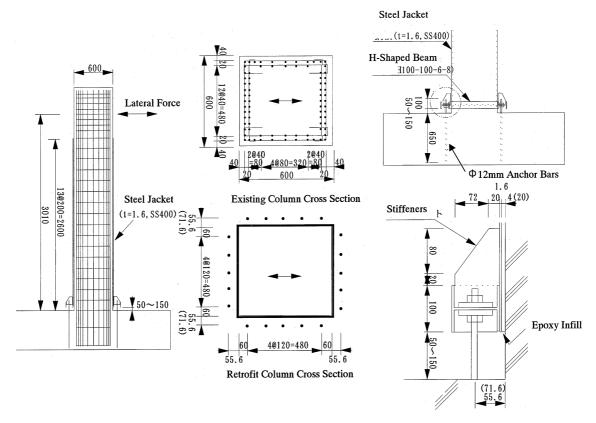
Details of the cyclic loading test specimens for as-built and retrofit reinforced concrete piers.
